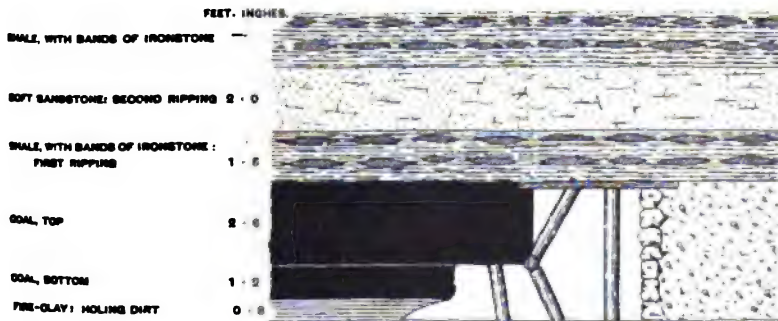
CROSS-SECTION, SHEWING ARRANGEMENT OF TIMBER, WHERE COCKERS ARE USED.
